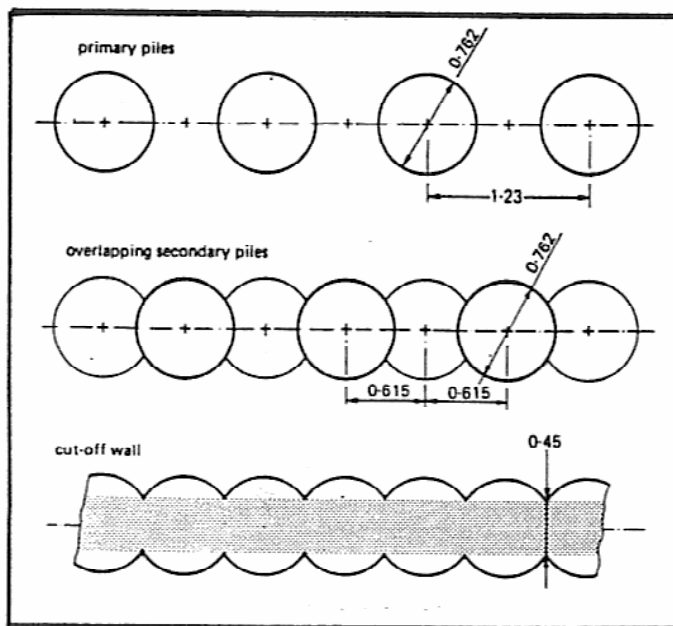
Construction phases of the cut-off wall, Khao Laem Dam (61).
